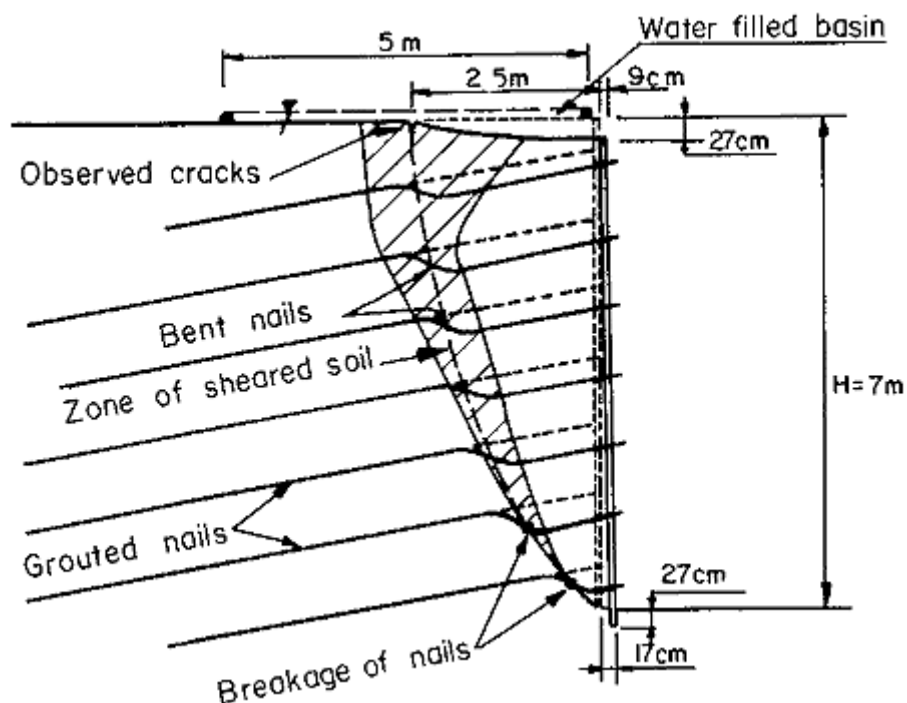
Post-failure observations of the first large-scale experimental soil nailed wall (after Clouterre 1991).
